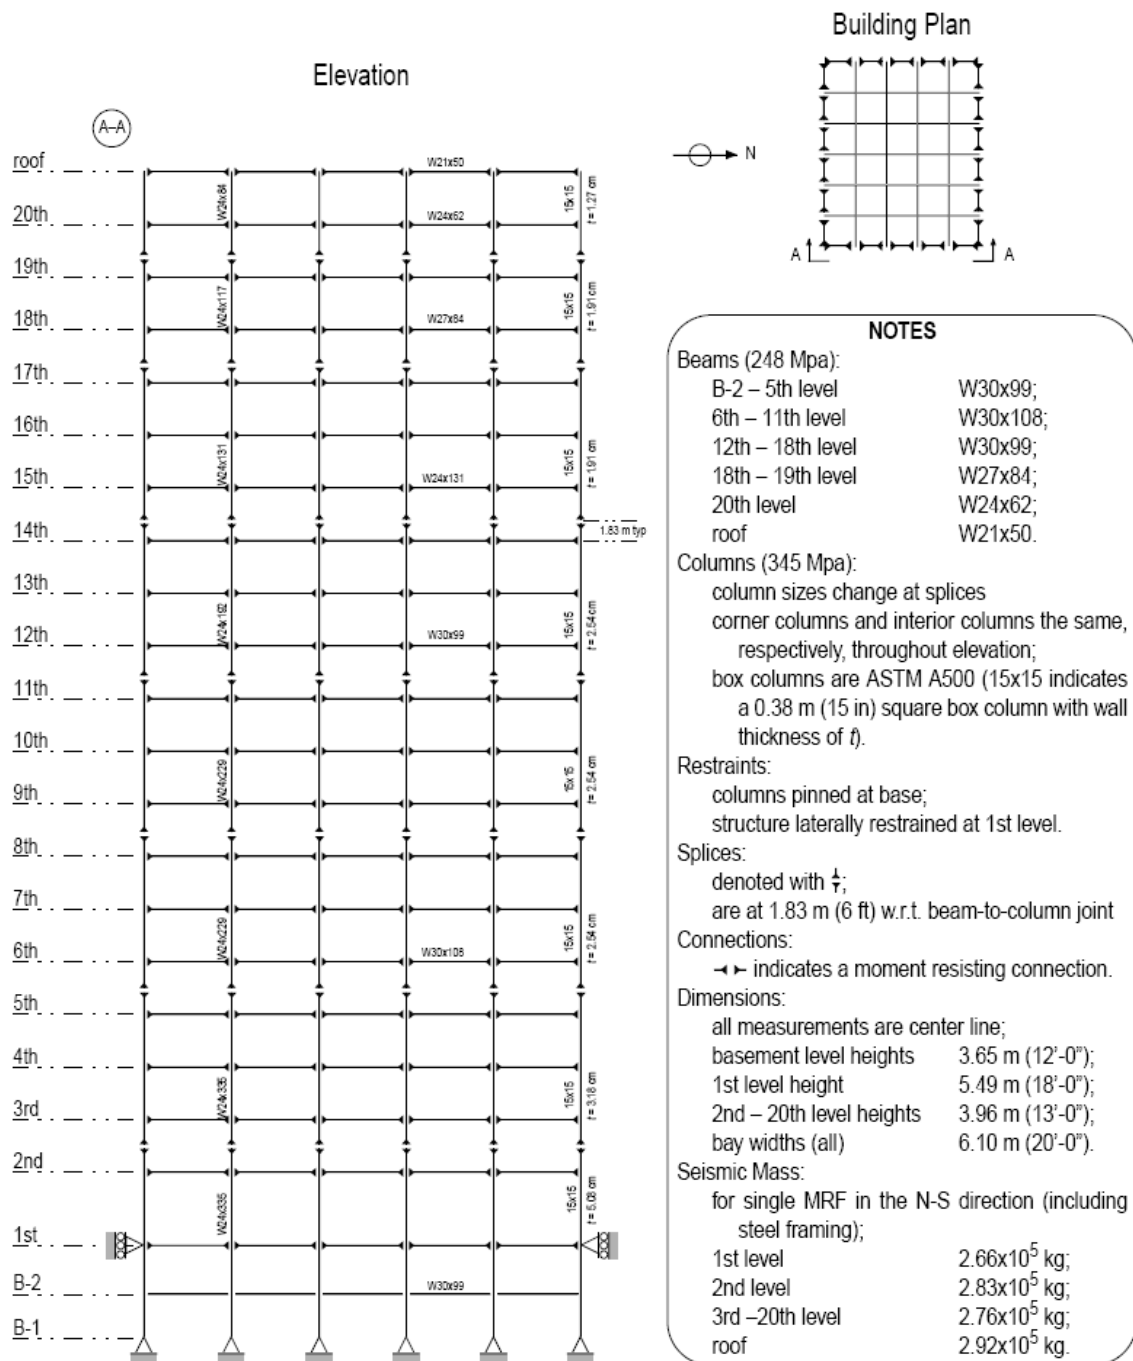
Los Angeles 20 story building structure (Spencer et al. 1999)
